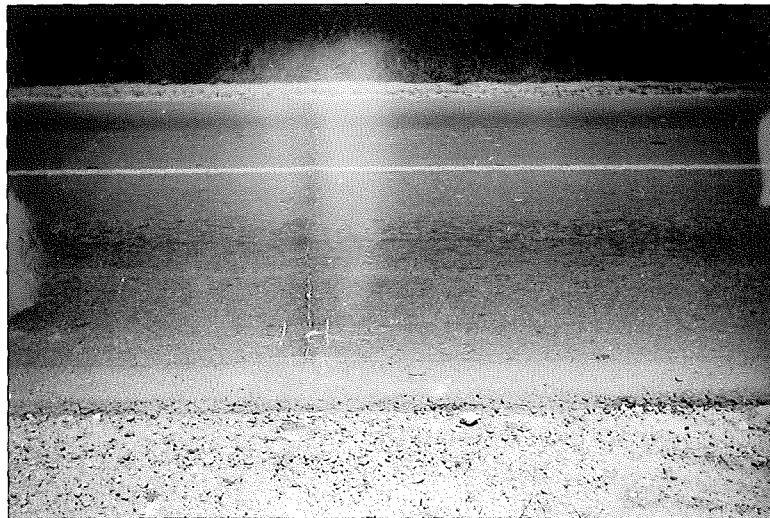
Heave due to extruding joint filler which extends entirely across pavement. Area is 6" wide and 1" high. Project 70-12, C2.
